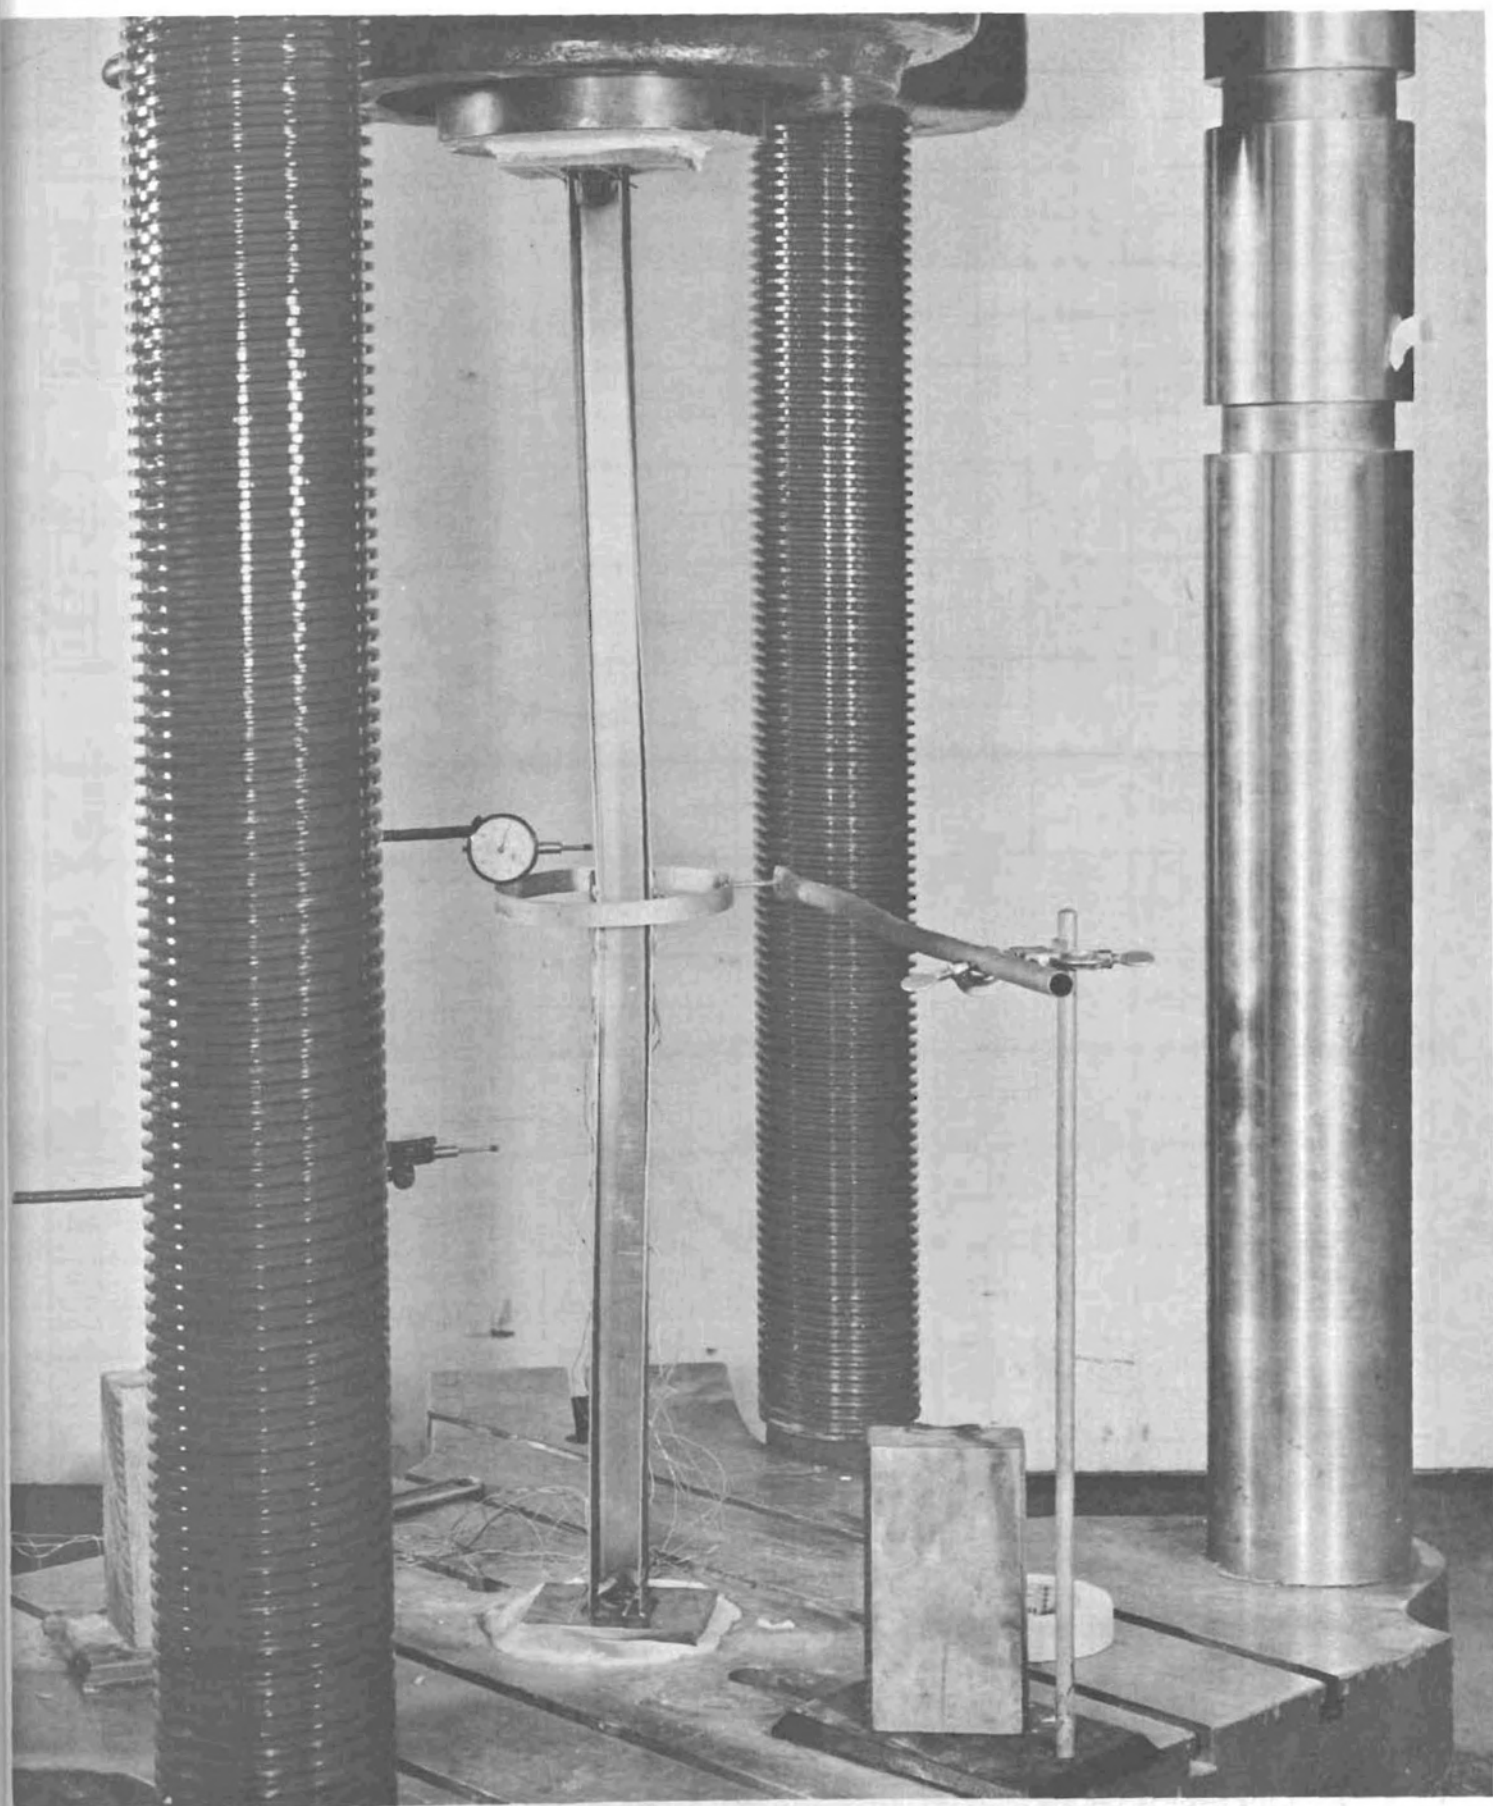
COLUMN TEST (CHANNEL SECTION)
